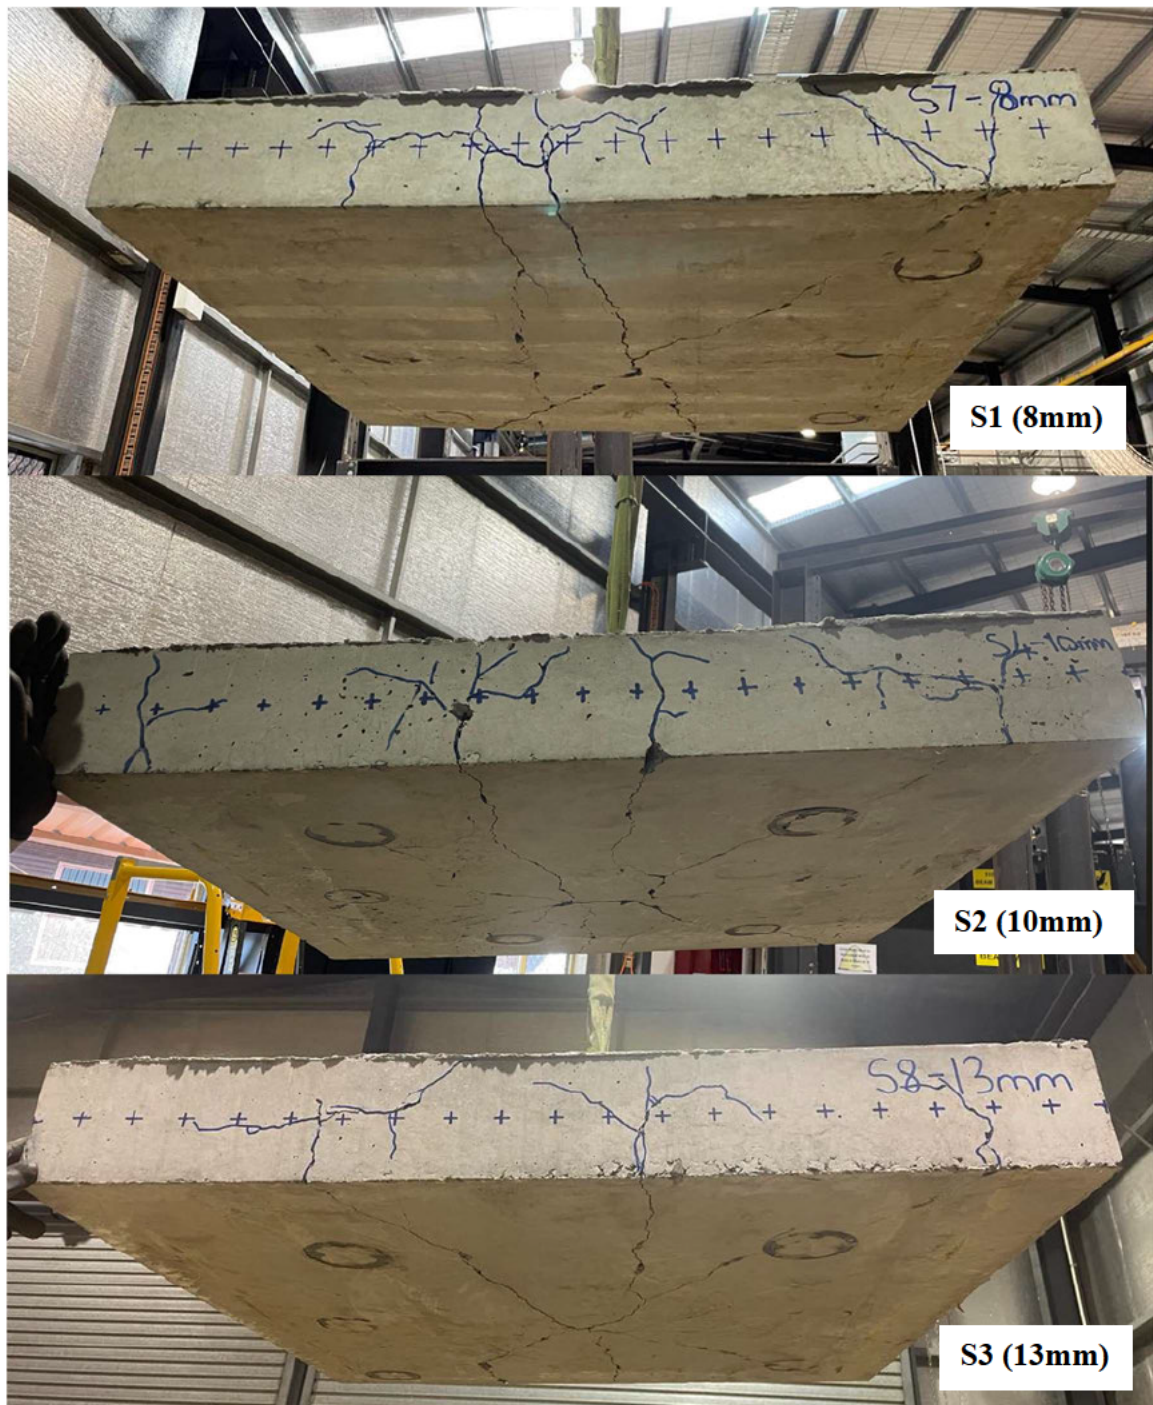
Cracking Pattern of Test Slabs (Angled View)
